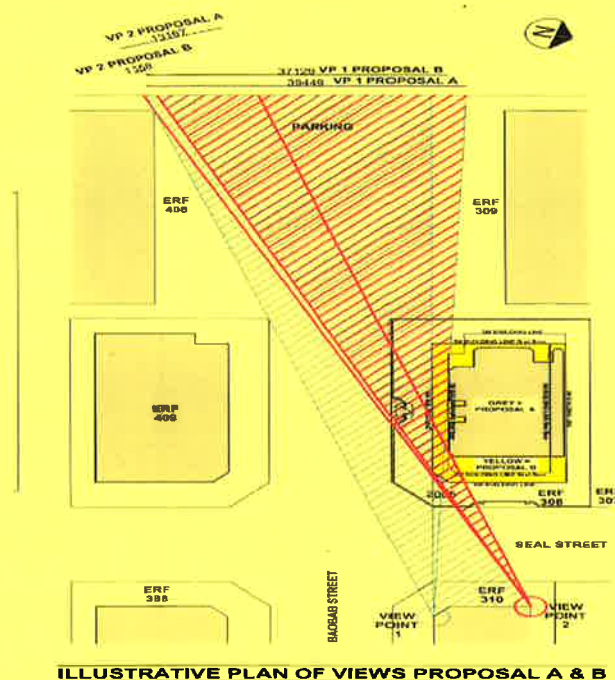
Plan indicating how the proposed plan impacts the view of the immediate neighbours (Provided by Applicant)
